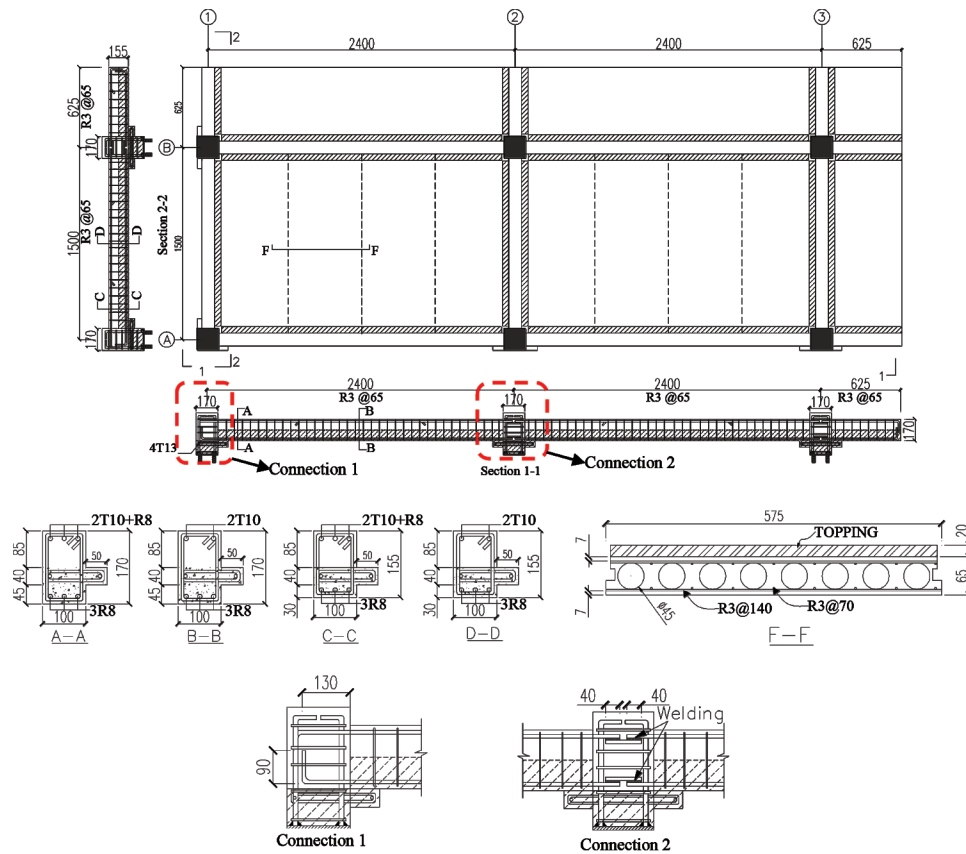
Details of precast Specimens PC1. (Note: Units in mm; 1 mm = 0.0393 in.; T is deformed reinforcing bar; R is plain reinforcing bar)
